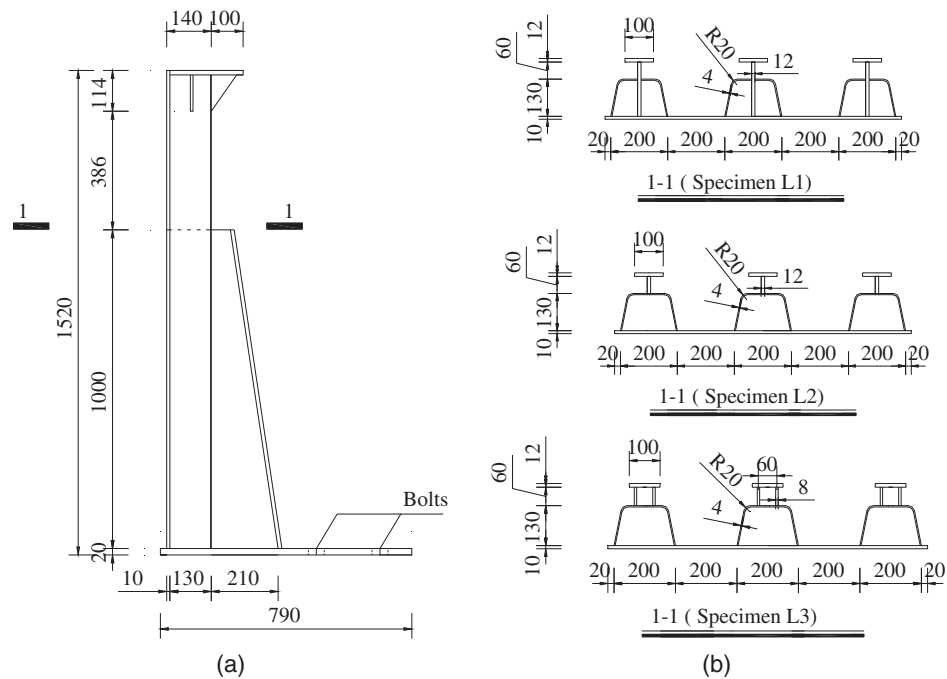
Details of specimens (in millimeter): (a) side views of specimens; and (b) cross views of specimens.
